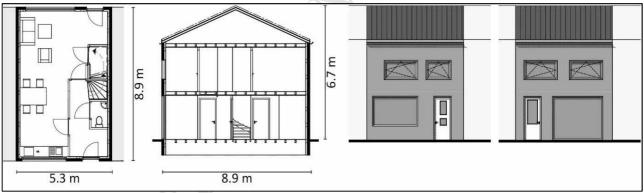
Terraced dwelling: floor plan, cross section and facades (front, back).
